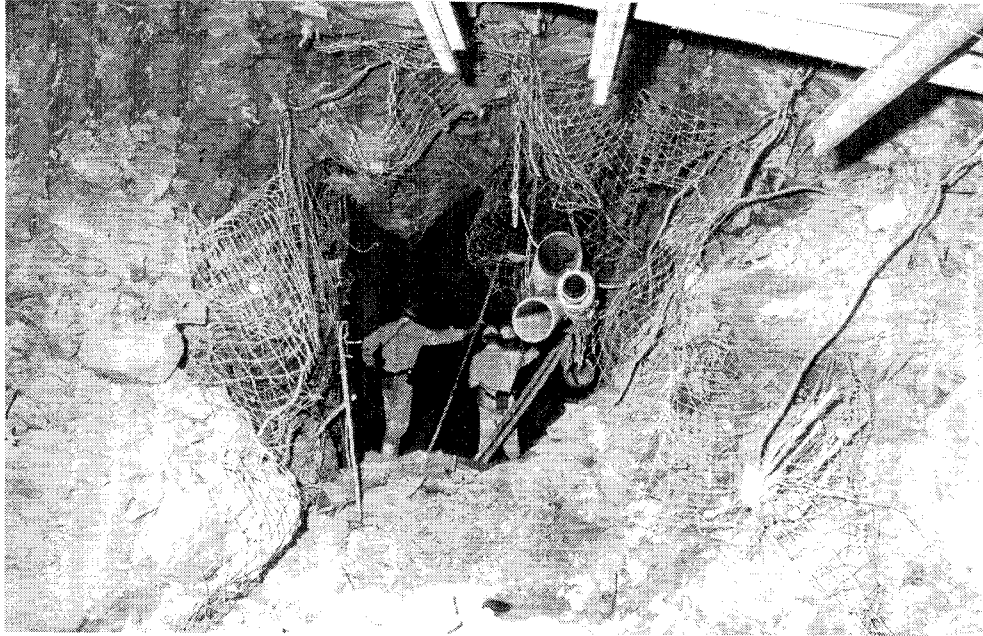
View south-west along 42 level haulage showing highly fractured nature of the rock mass, footwall heave of approximately 1,5 m, bulk sidewall deformation (bottom right) and failure of mesh and lacing in upper portions of excavation.
